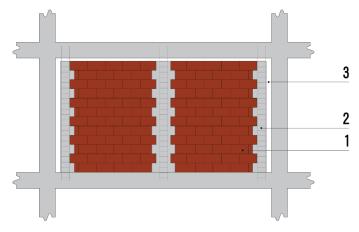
A masonry infill wall (1), protected from shaking perpendicular to its length by intermediate, or 'practical columns' (2), and separated from columns and beam by narrow gaps (3) subsequently infilled with soft material and covered with a flashing.
